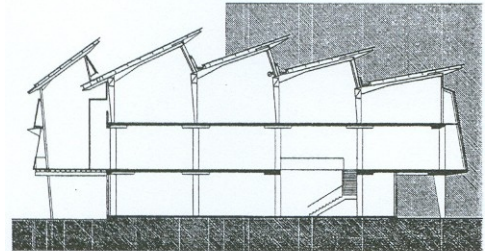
Cross Section [McINSTRY, M. 1999.p.66]
